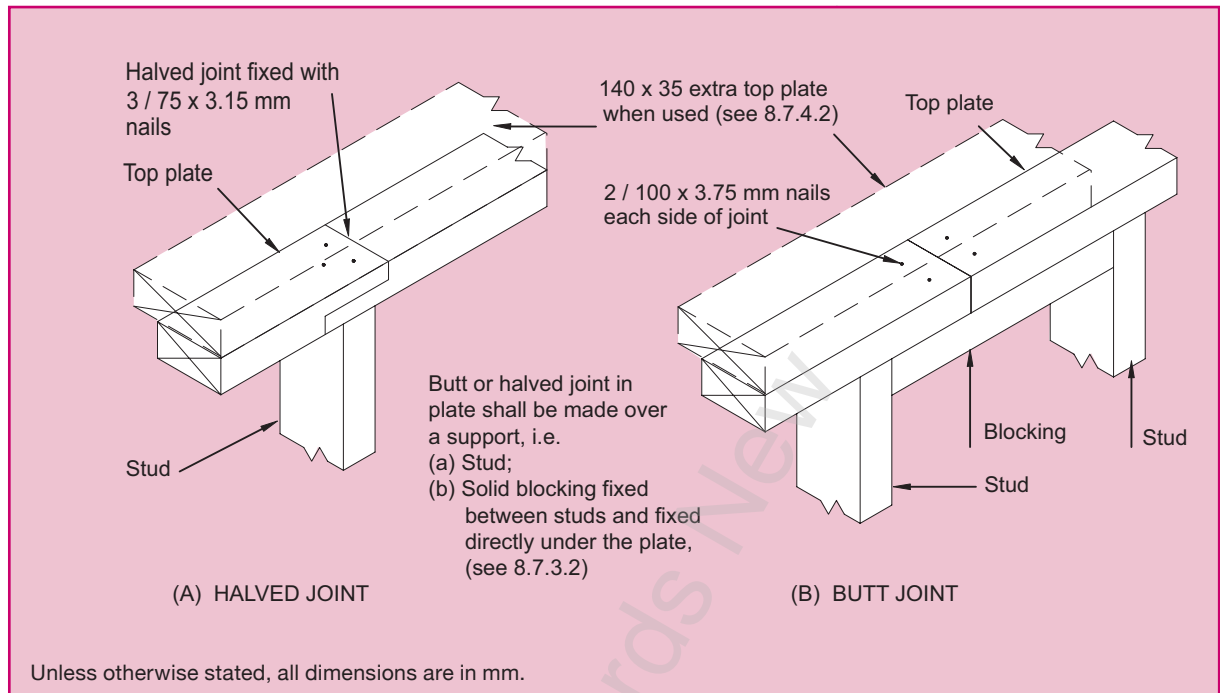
Connecting top plates – Walls not containing bracing (see 8.7.3.2)
